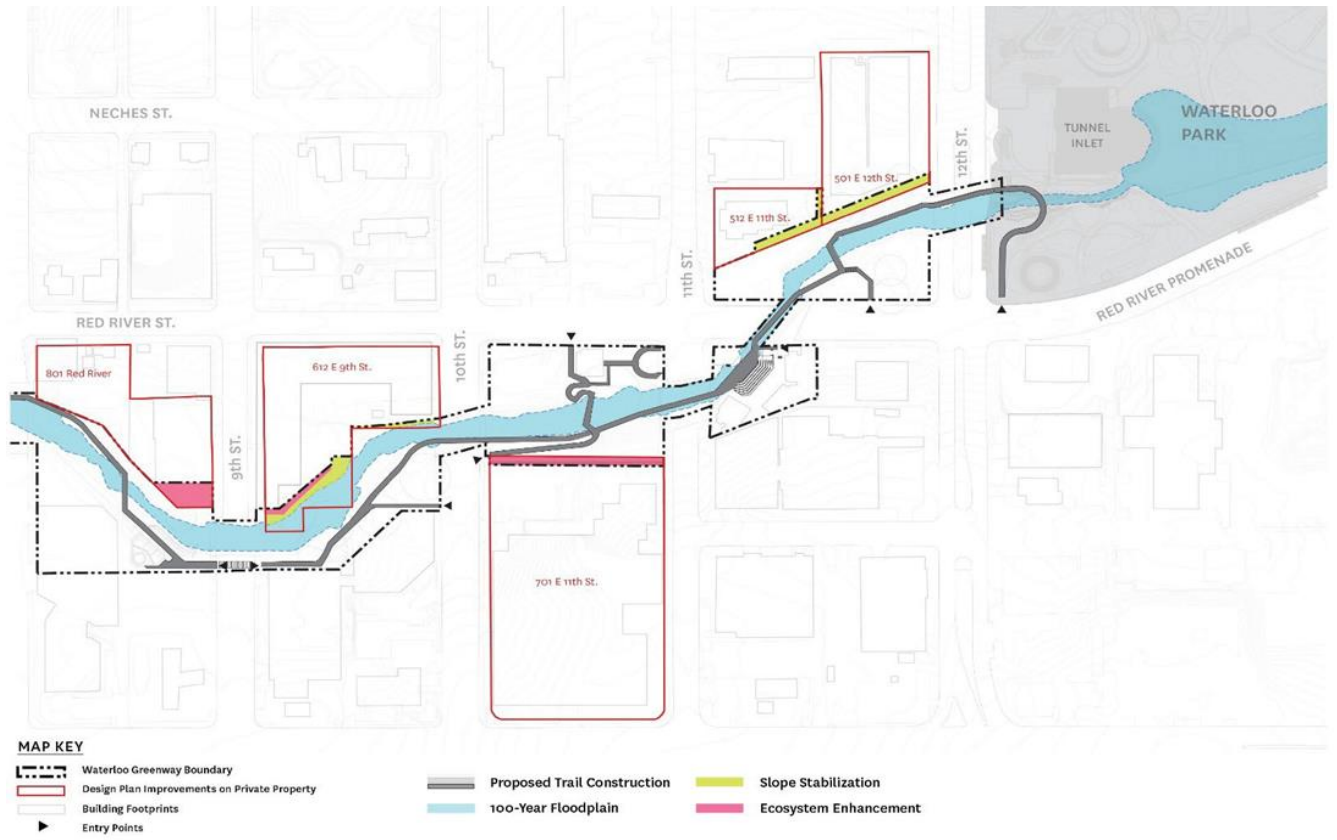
Spatial Requirements for Waller Creek Design Plan Improvements (8<sup>th</sup> to 12<sup>th</sup> Streets)
